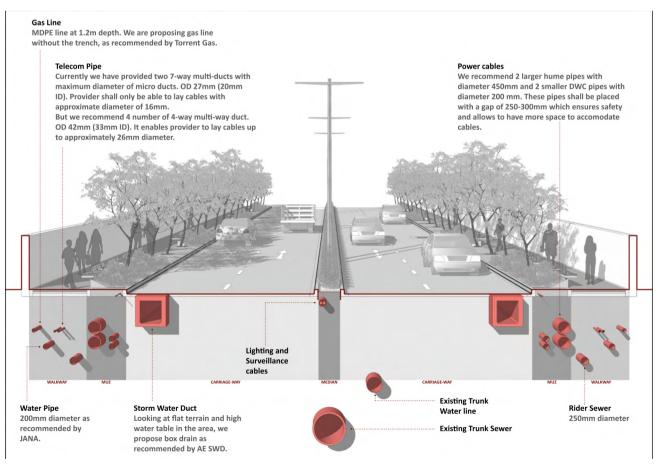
TYPICAL COMPLETE STREETS CROSS SECTION
